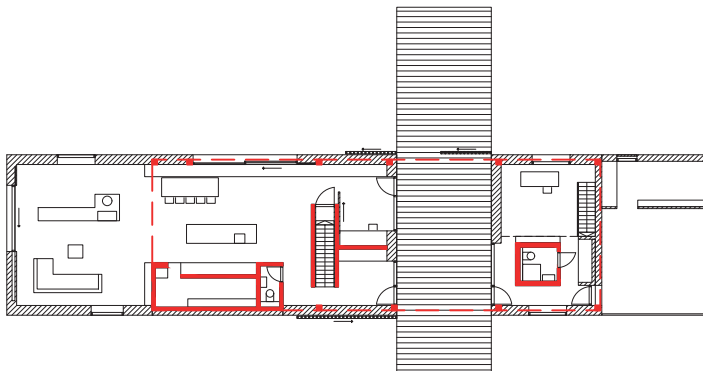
Main construction, concrete core and floors with steel columns, 1:400
